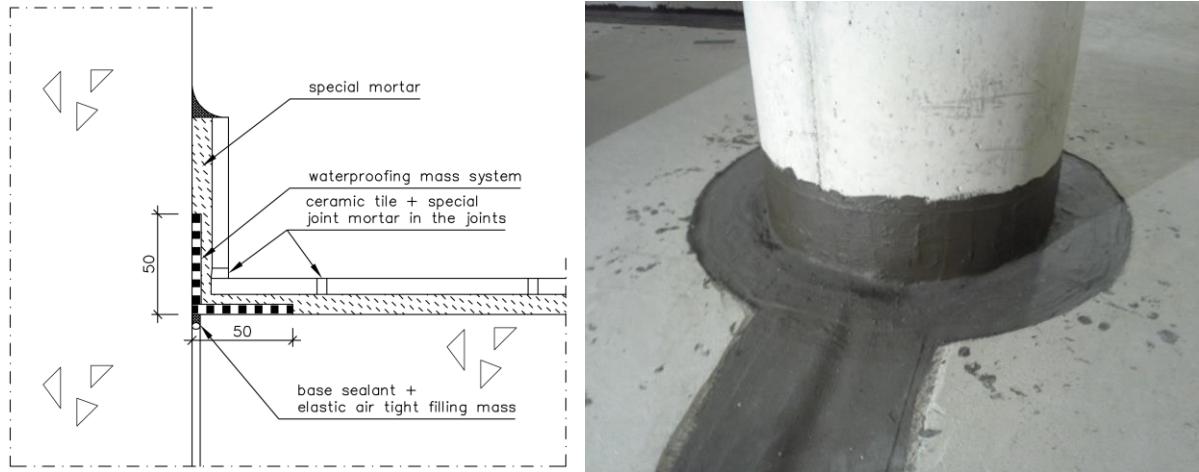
Principal solutions for ground floor concrete slab and concrete wall or pillar joint air tightness renovation with waterproofing mass system. Extract from a plan and photos from impletion at the site.
